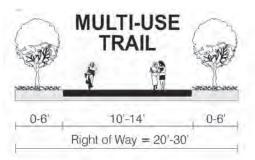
Canby TSP Multi-Use Trail Cross-Section
